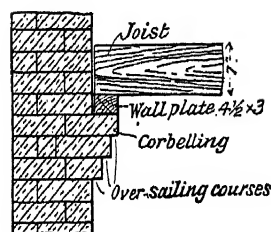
Section through Wooden Floor carried on Brick Corbelling.
